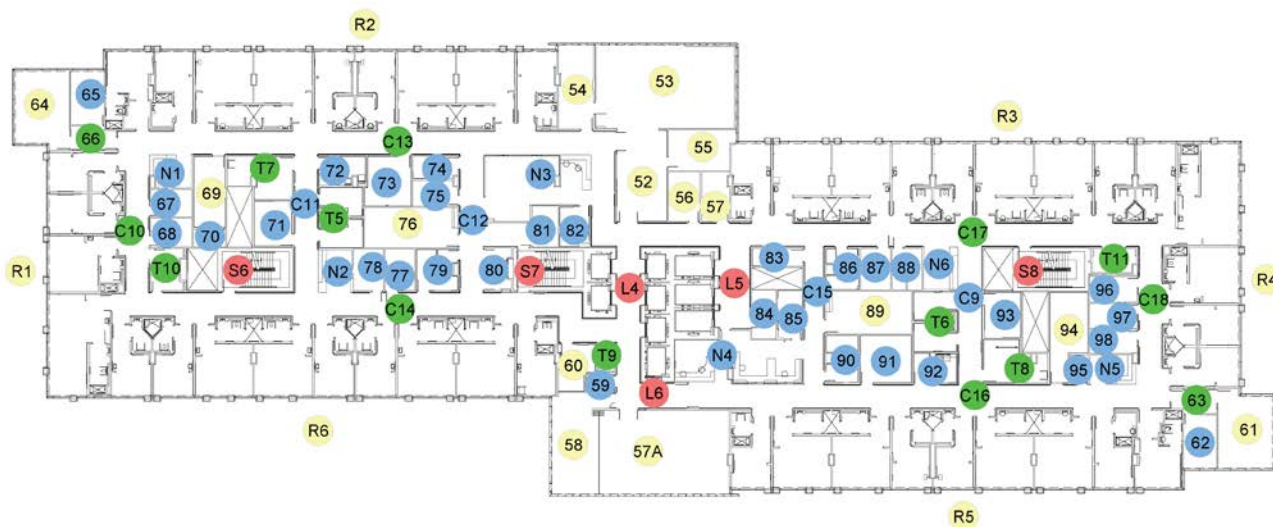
Ground Floor plan of Bridgepoint Active Healthcare (Source: Retraced image from ArchDaily.com)
